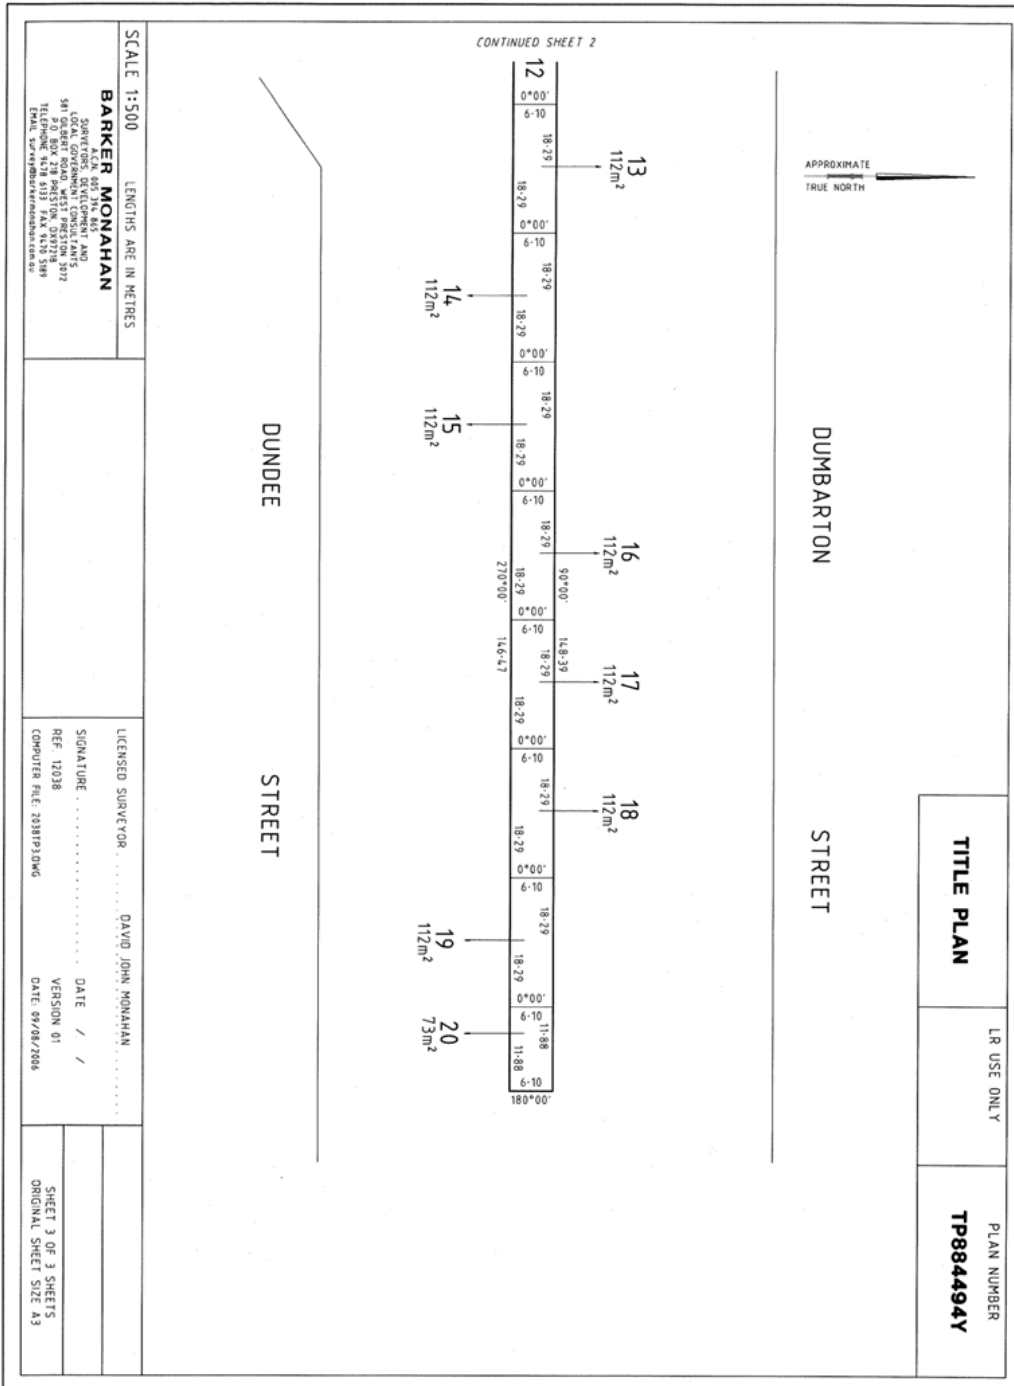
Site Plan road adjoining 7 Dumbarton Street and 55 Dundee Street, Reservoir
